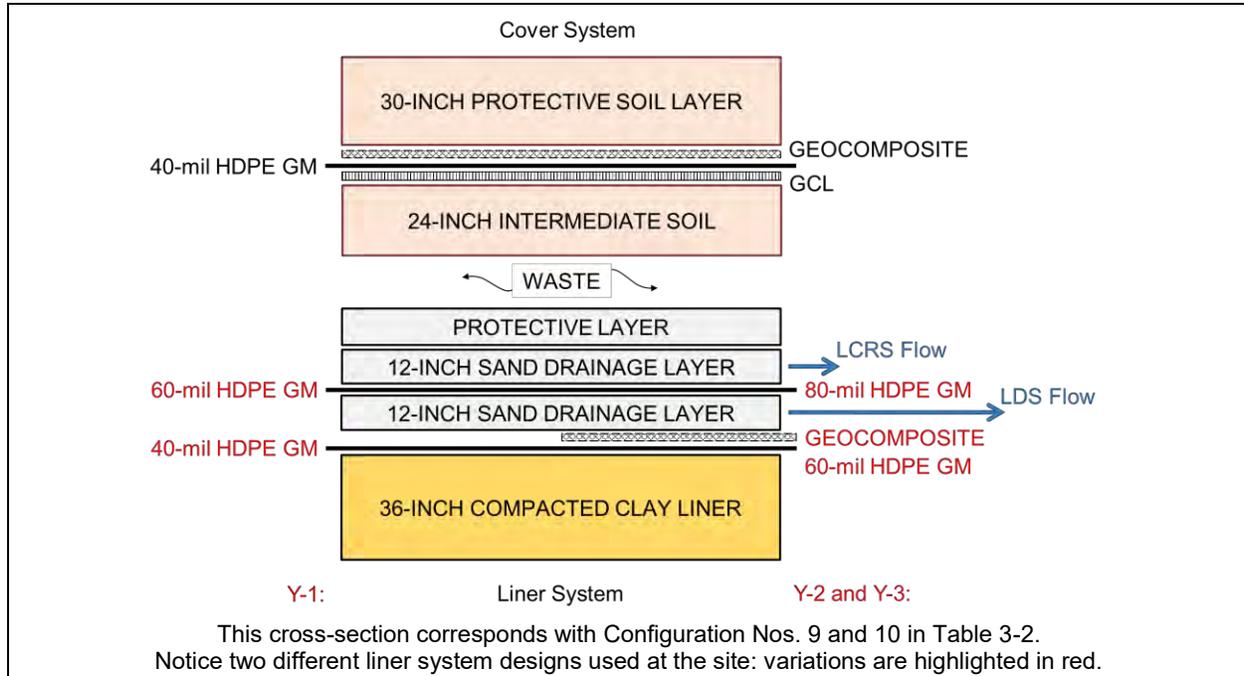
Liner and cover system cross-sections for Landfill Y
